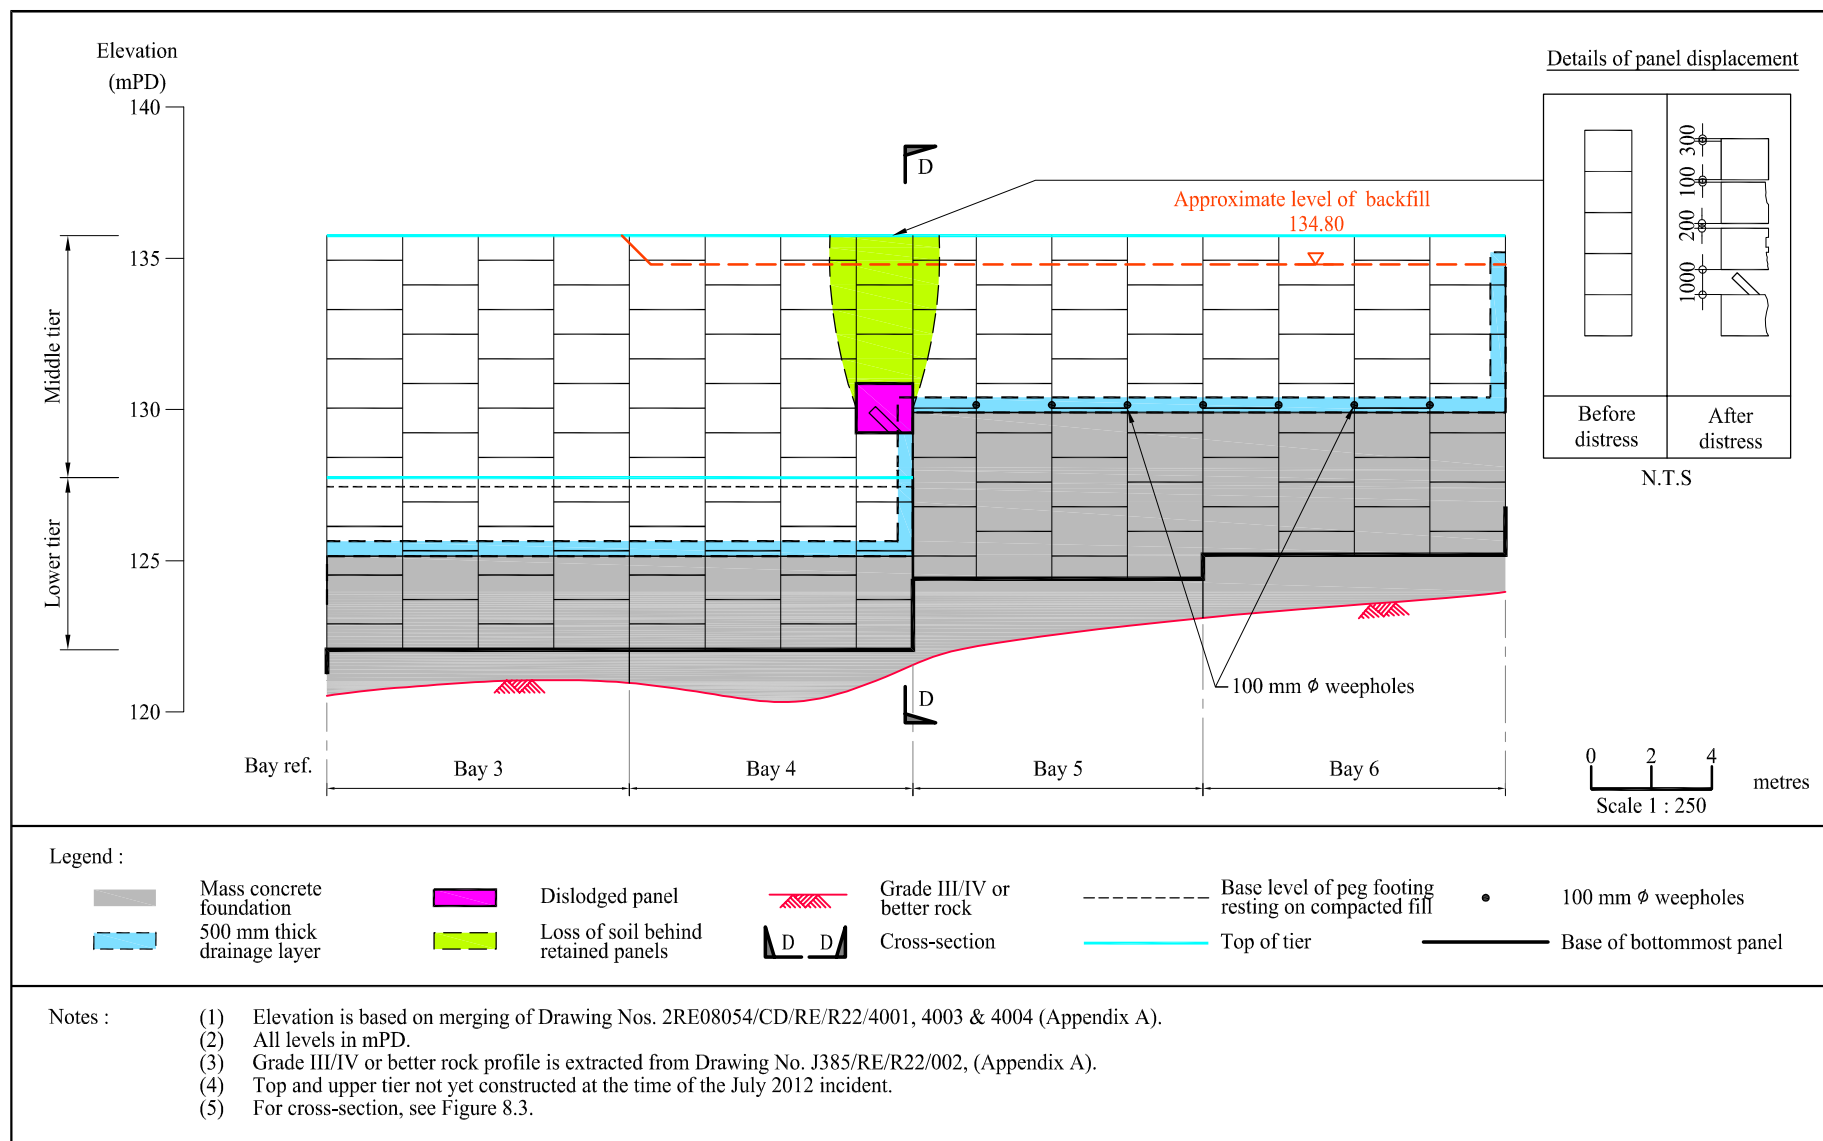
Elevation of the July 2012 Incident at Wall R22
